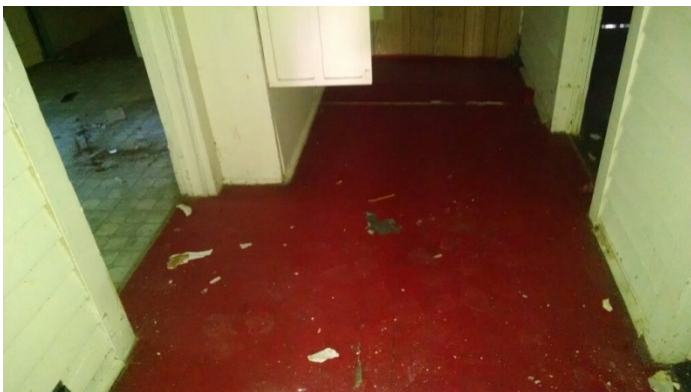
Red sheet vinyl flooring with no mastic in the pantry.
